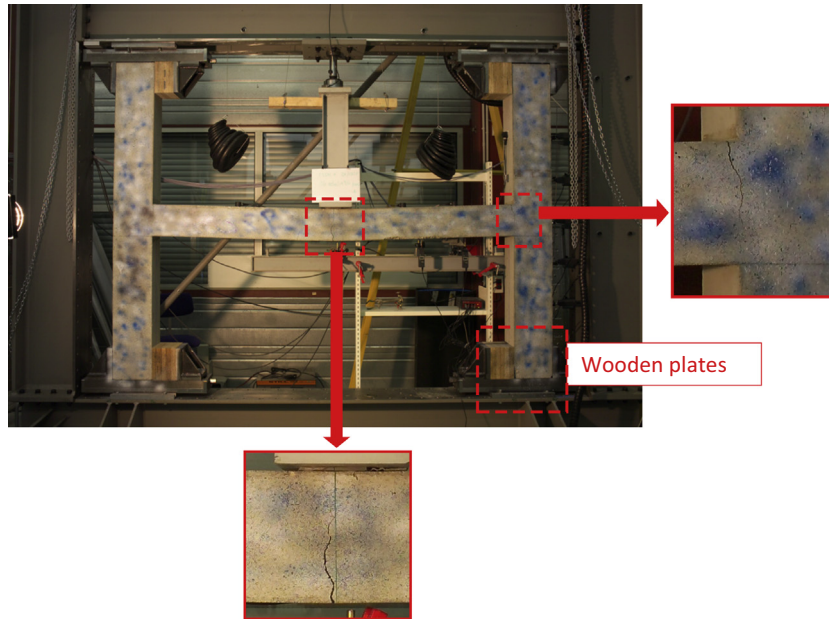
The reinforced concrete frame studied, at the maximal load.
